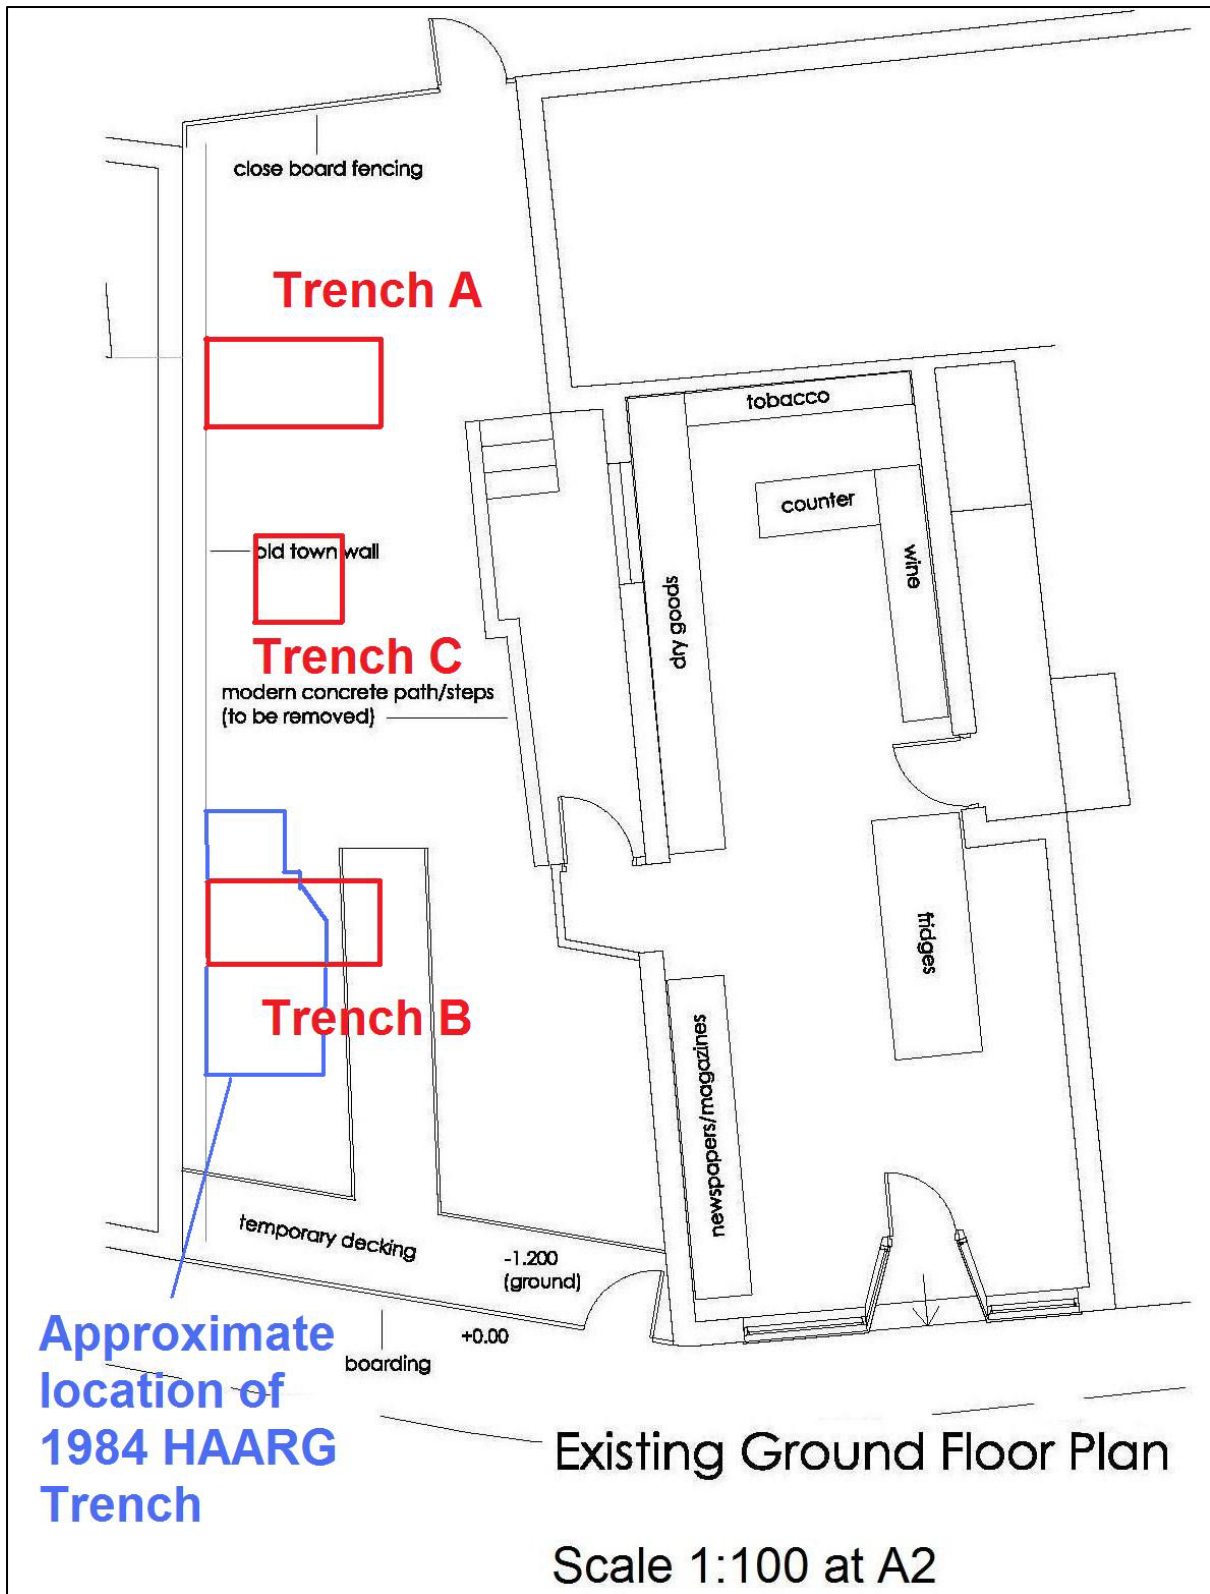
59 High Street, Hastings: Site plan showing the location of the evaluation trenches and the location of the 1984 HAARG trench (Adapted from architects drawing)
